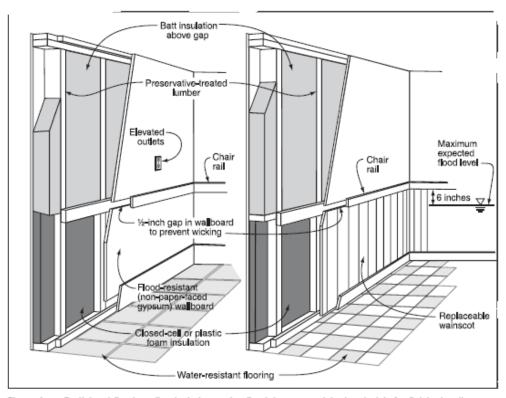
Partial wet floodproofing technique using flood damage-resistant materials for finished wall construction.
